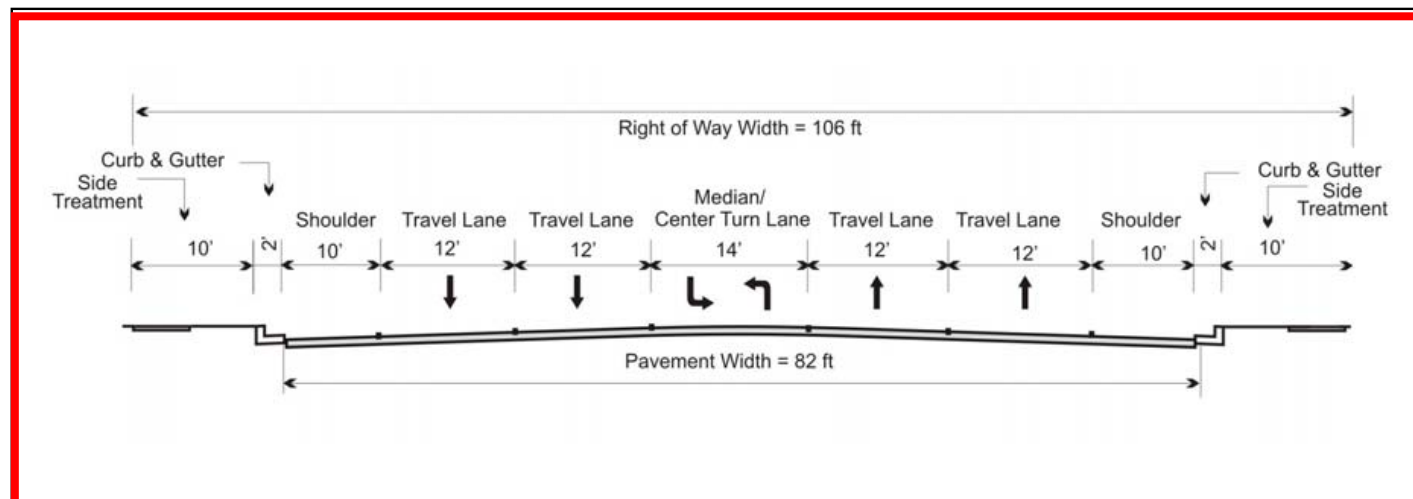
Five-lane Arterial Cross-section, Between Intersections
